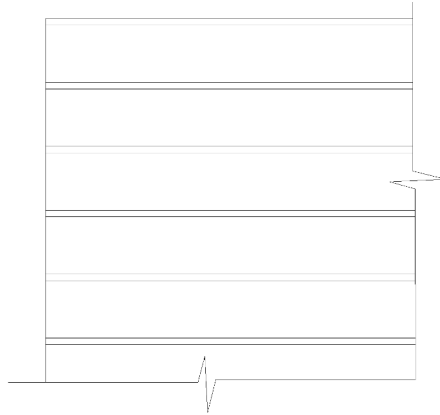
A Typical Plan View of the Supporting Arrangement after Removing strips in One Direction
